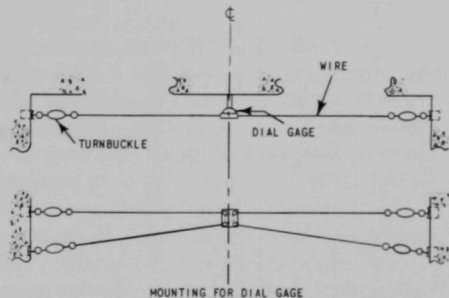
Arrangement for Measuring Deflection at Center Point of Inside Surface of West Wall of Cell No. 5
